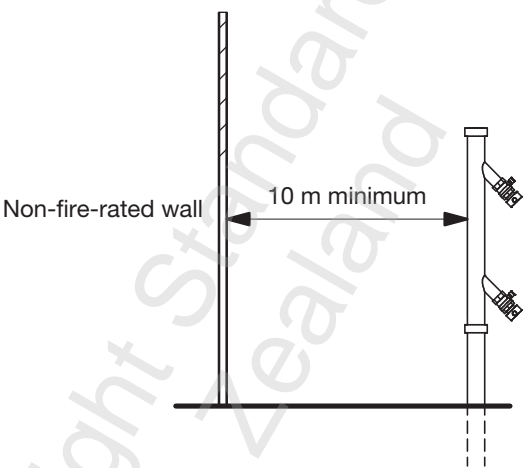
Unsprinklered building – Hydrant outlet protection – Separation distance option – Section view
